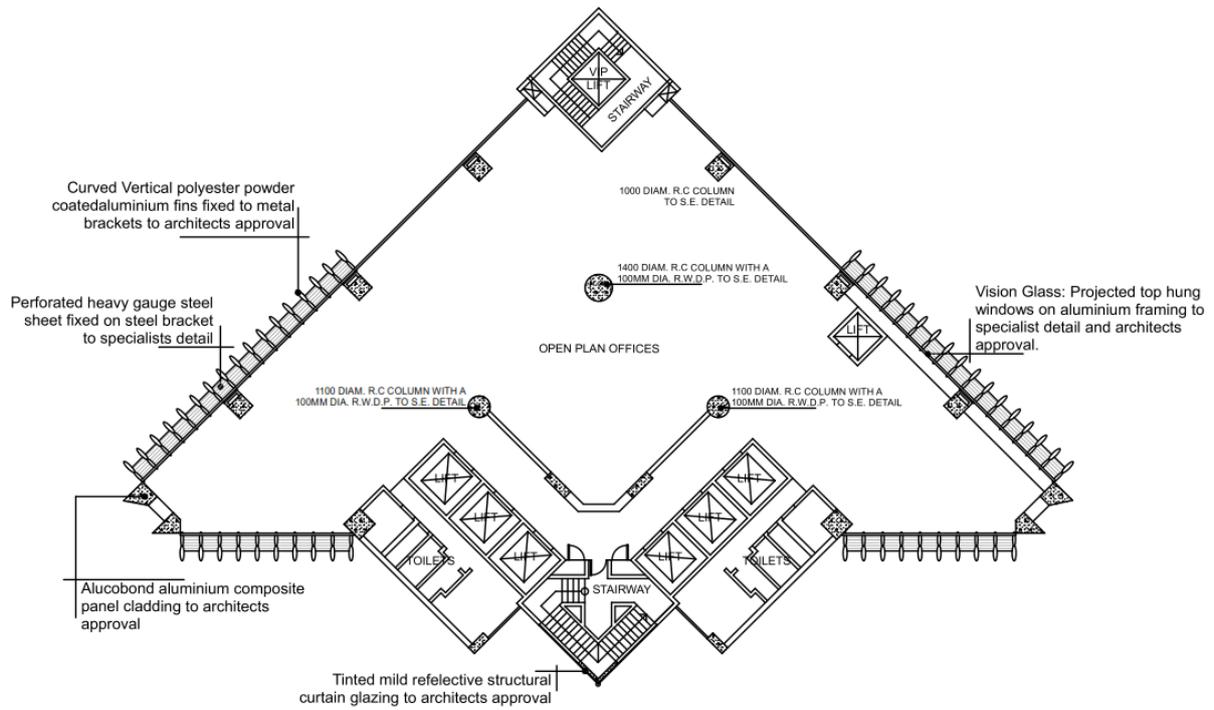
KCB Towers typical tower plan. Source: Planning Systems 2008
